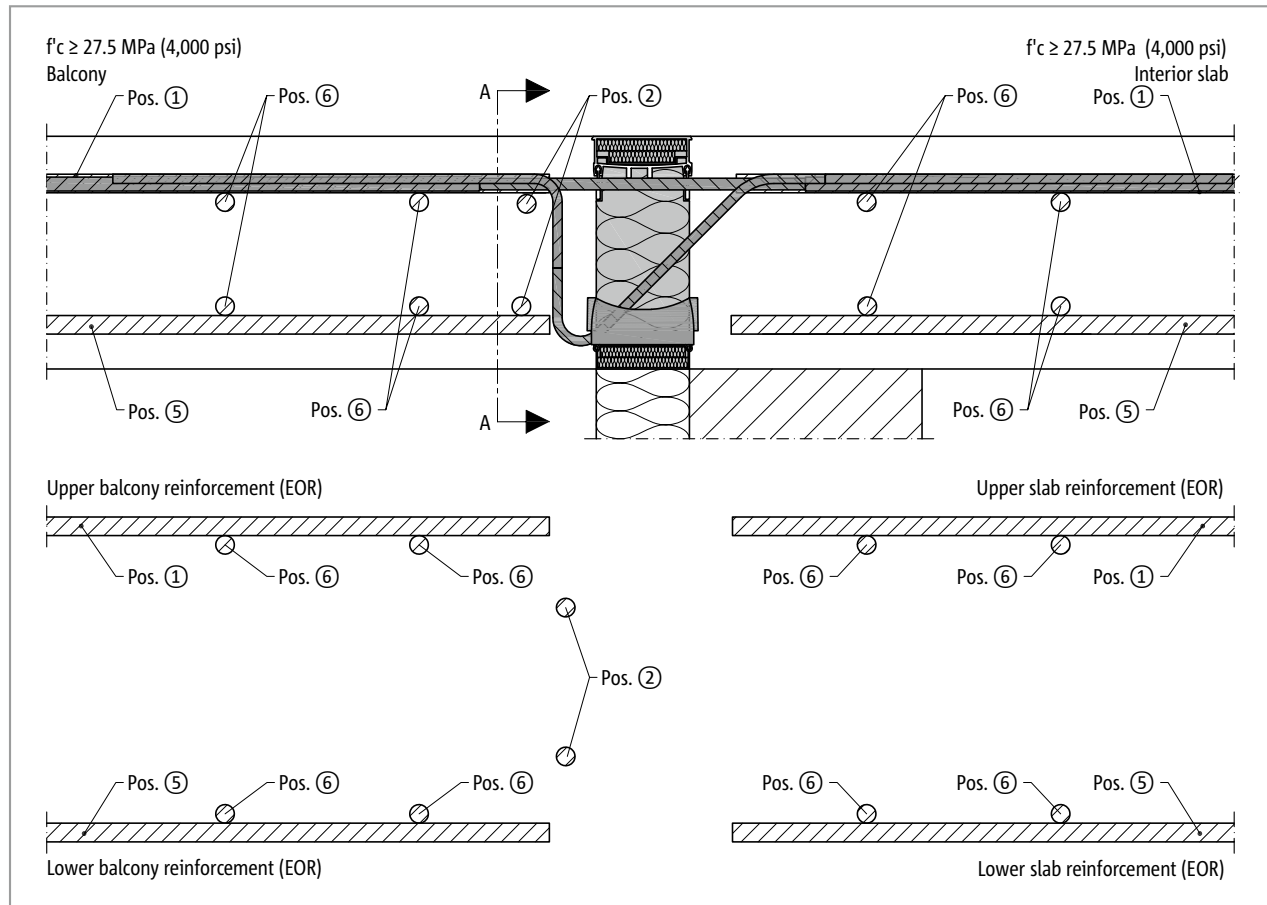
Schöck Isokorb® T Type CK: Cross section of recommended cast-in-place reinforcement (supplied by others) - direct support
